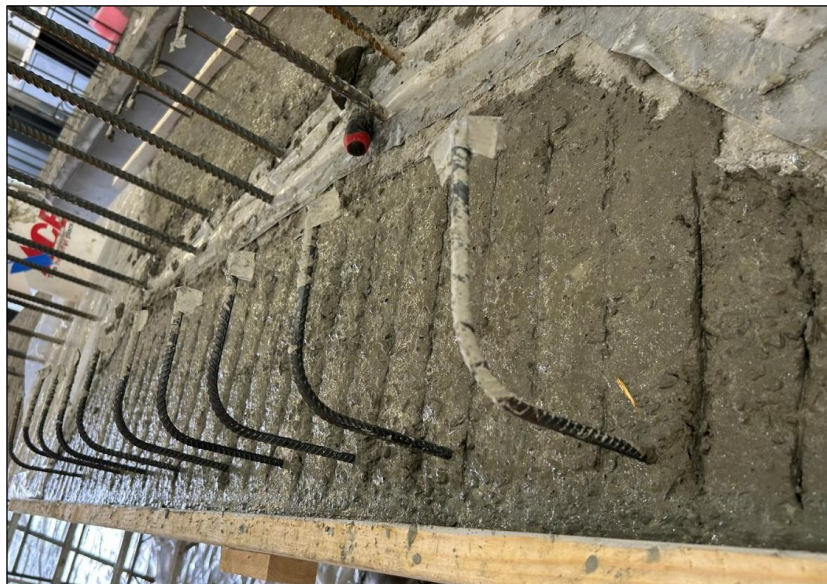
Photo. Concrete repair surface grooves matching girder top flange.
